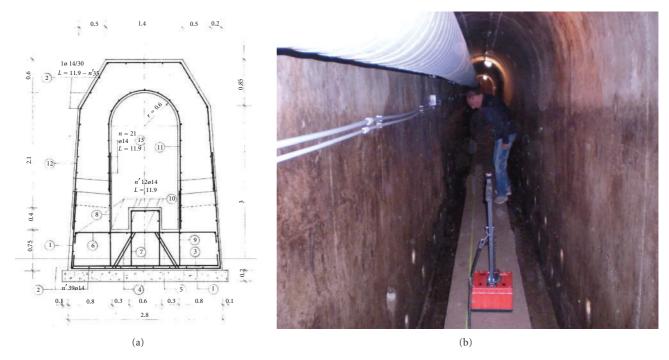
Detail of the longitudinal inspection tunnel: (a) cross-section and (b) picture.
